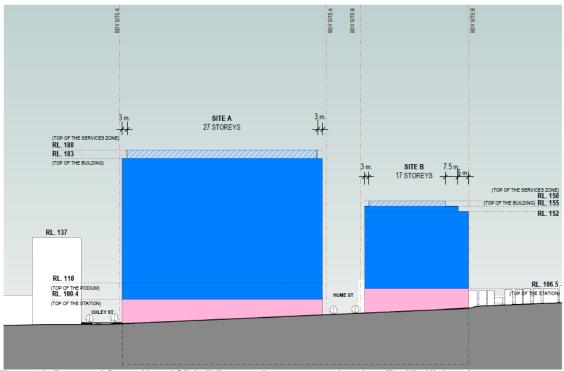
A: Proposed Crows Nest OSD building envelopes - west elevation (Pacific Highway)
